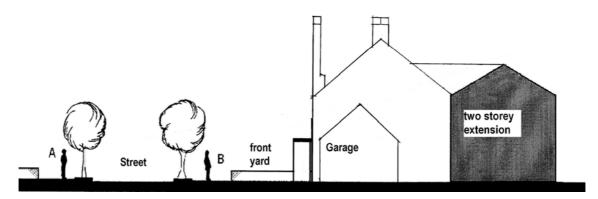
Side view of an acceptable two-storey addition to a two storey dwelling with the roof set lower than the main roof. If the new roof is visible it should be finished in Marseilles terracotta tiles to match the original roof.
